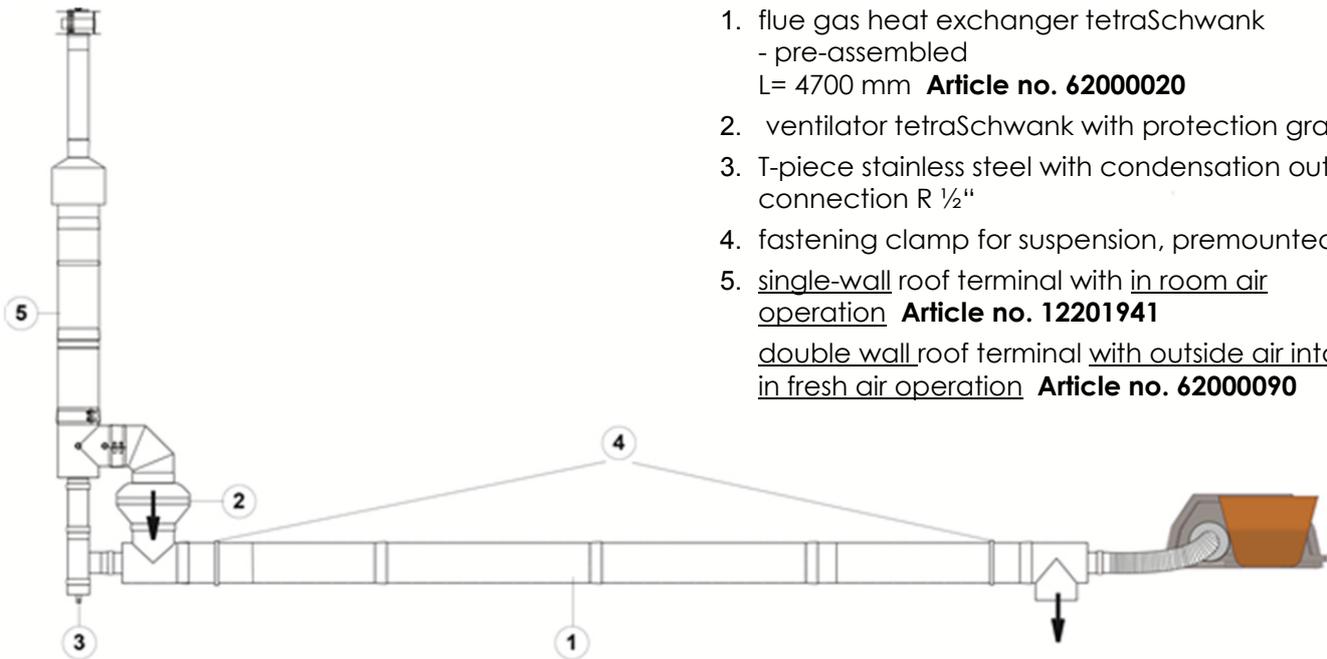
Installation tetraSchwank with outside air intake in fresh air operation, with roof terminal stainless steel
